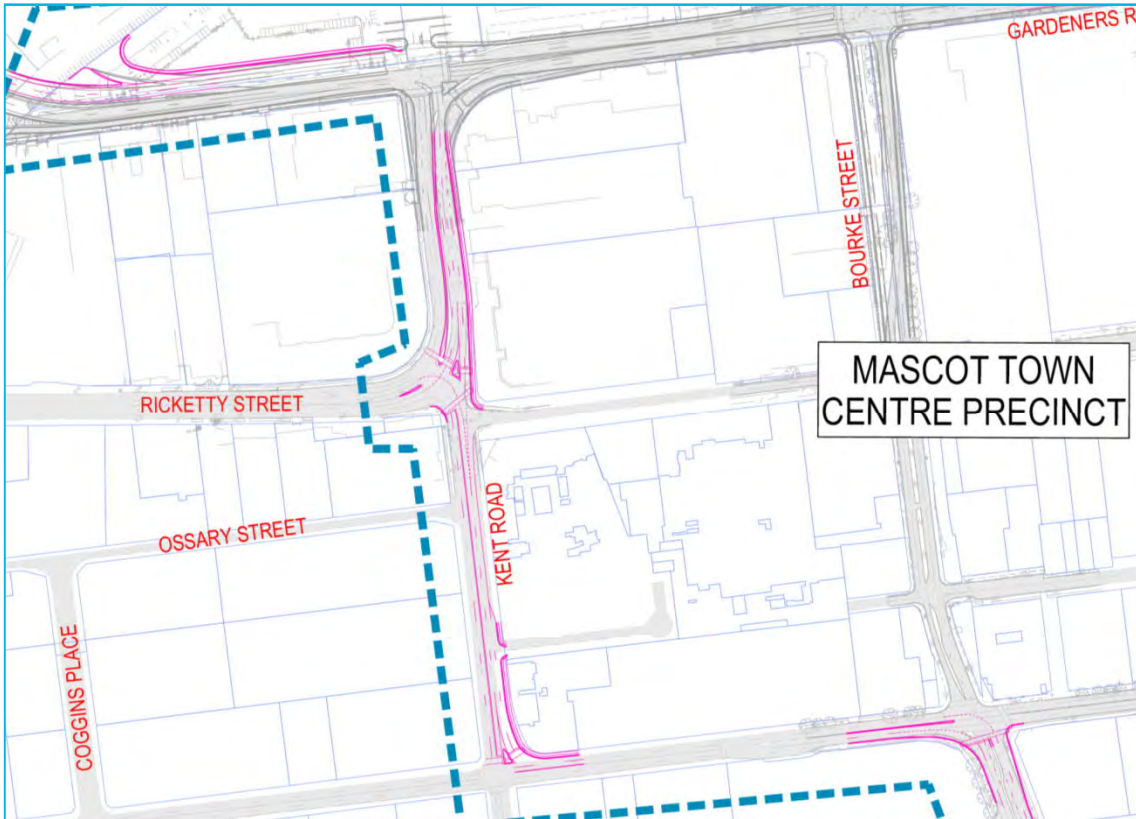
Mascot Town Centre Precinct changes – Kent Road/Coward Street, Kent Road/Ricketty Street and Gardeners Road/Kent Road
